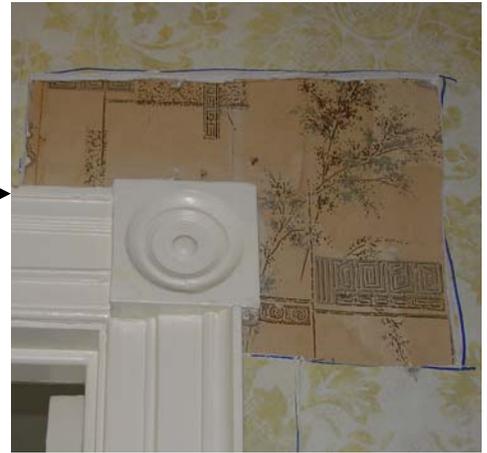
Room 101: Detail at west doorway to Room 102 showing circa-1960 wallpaper on plaster beneath existing plasterboard, August 2007.
